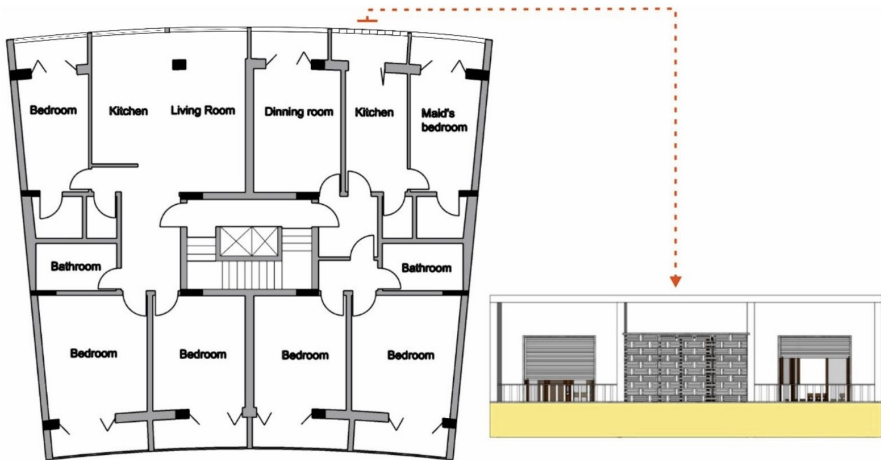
Typical floorplan, on the right, with arrow indicating part of the apartment's original elevation, and an example showing the modified layout on the left. Source: (Author 2019)
